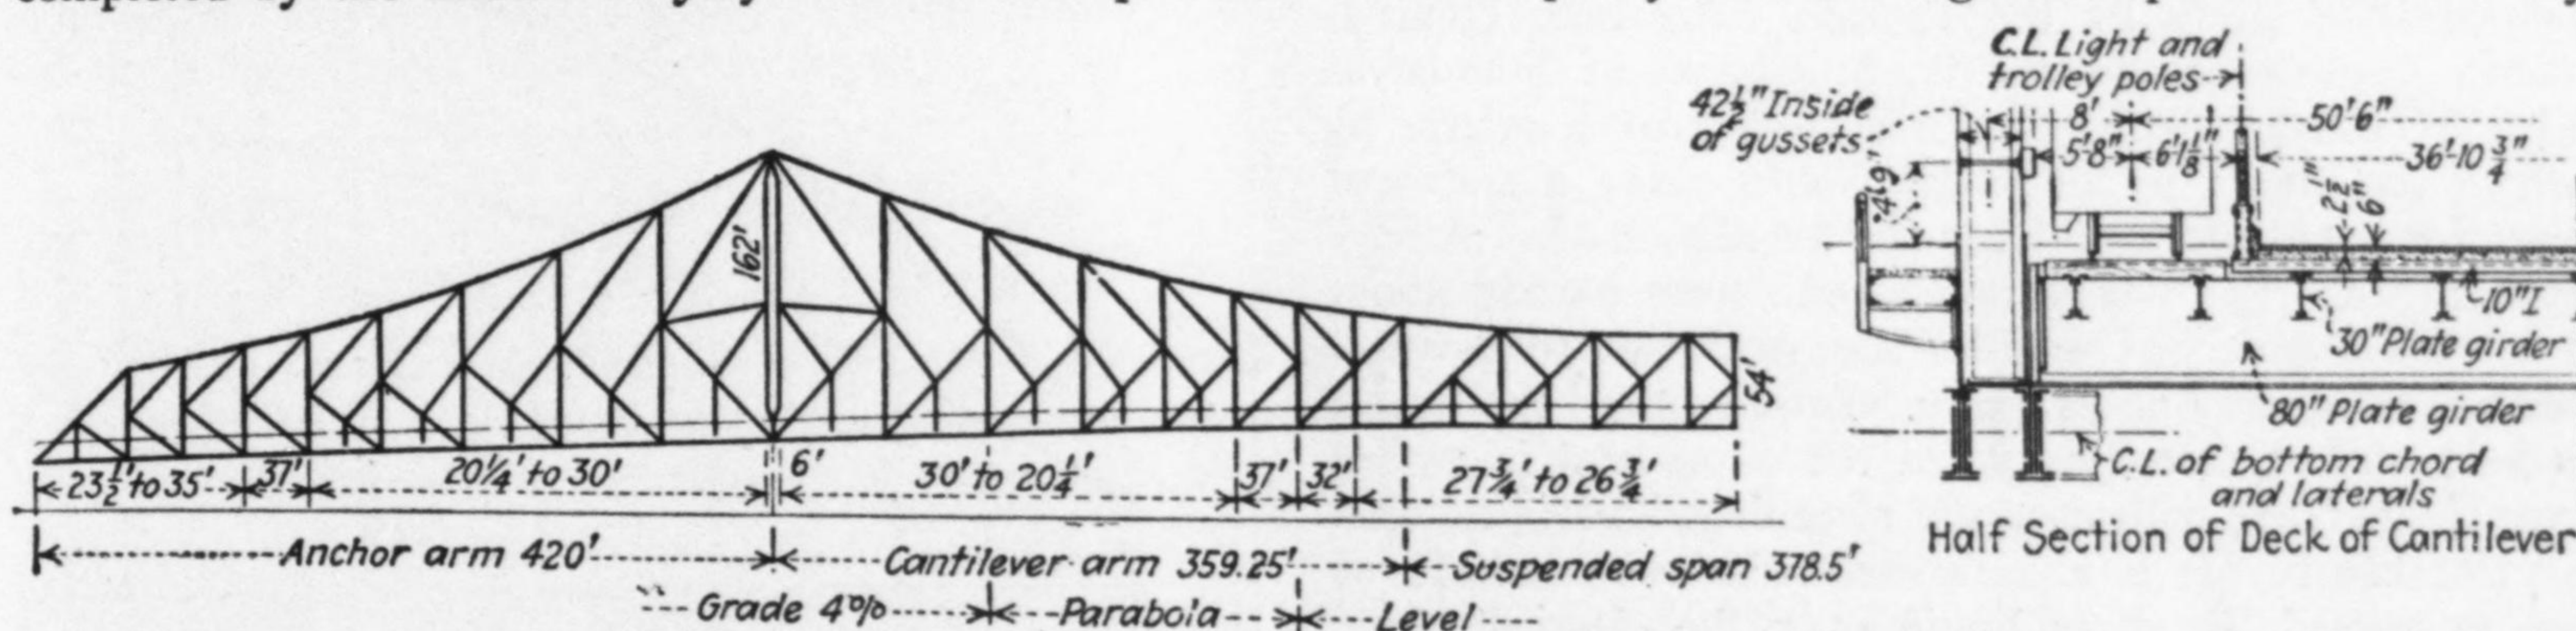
HALF ELEVATION AND CROSS-SECTION OF CANTILEVER SPAN
